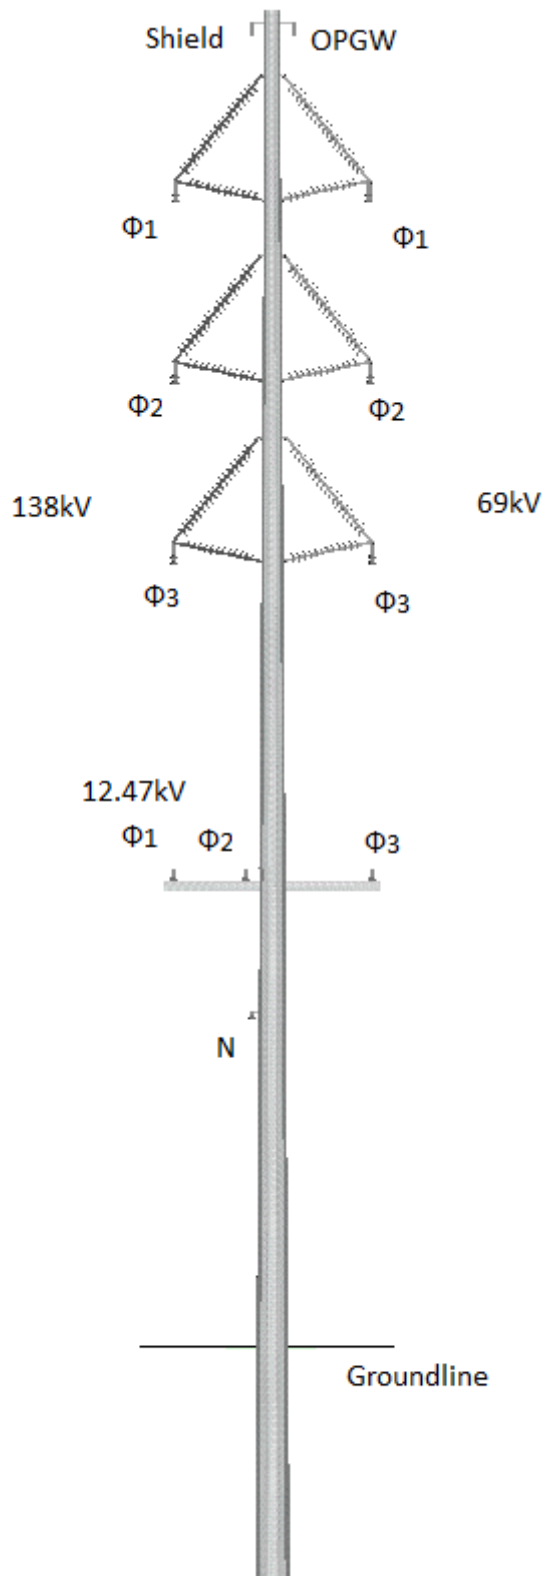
Typical cross-section model used for EMF calculations for Section 2A.
